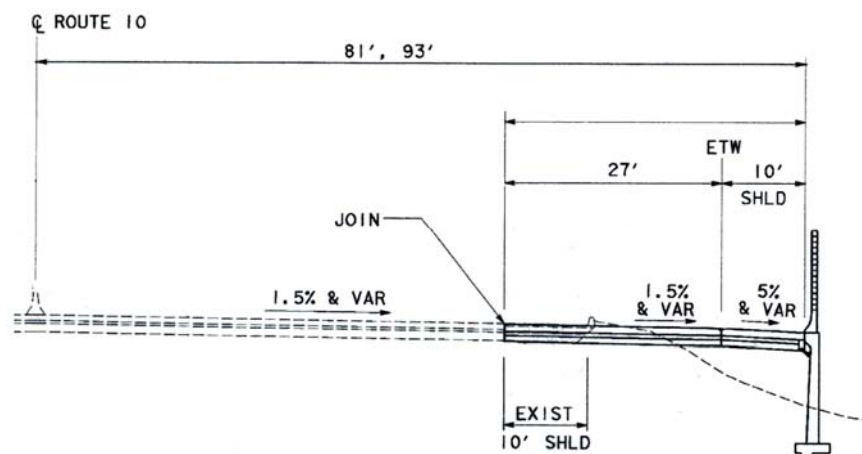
Original pavement cross-section (from the project plans) for widening Interstate 10. (Note: 10 ft = 3 m, 27 ft = 8 m)
